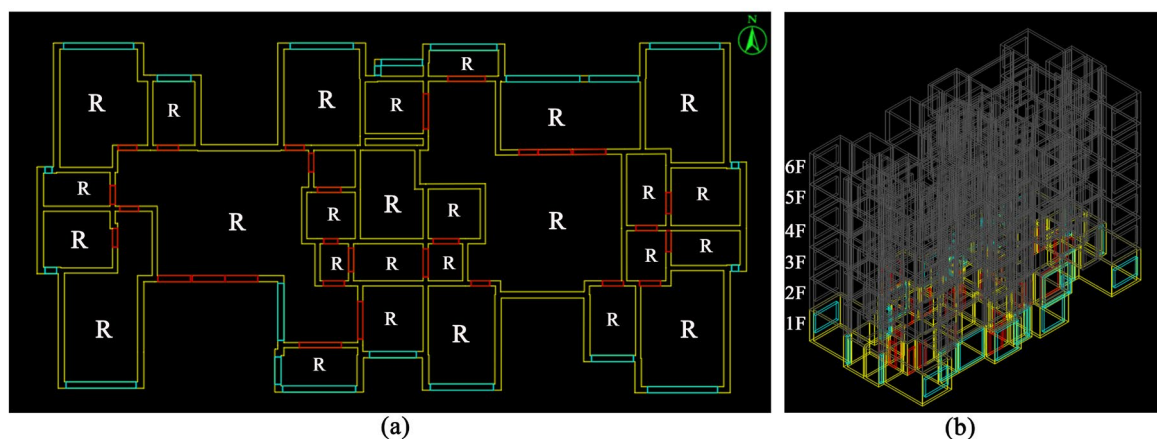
Reference residential building model: (a) standard floor plan; (b) three-dimensional view.
